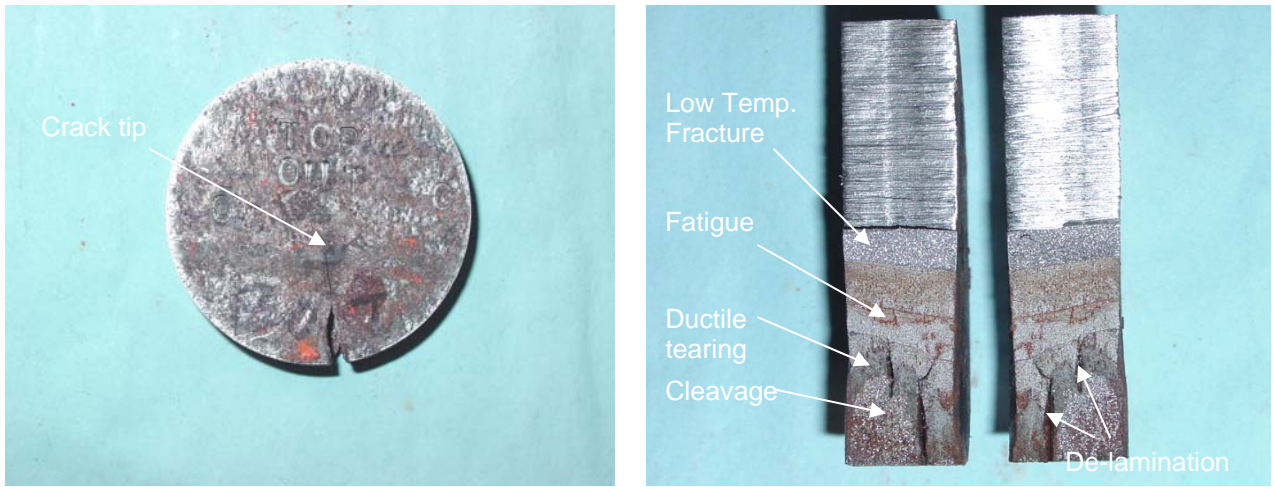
Crack Tip of Web Fracture Arrested By Plate De-laminations. Note Fatigue Crack Extension Prior To Drilling Core.
